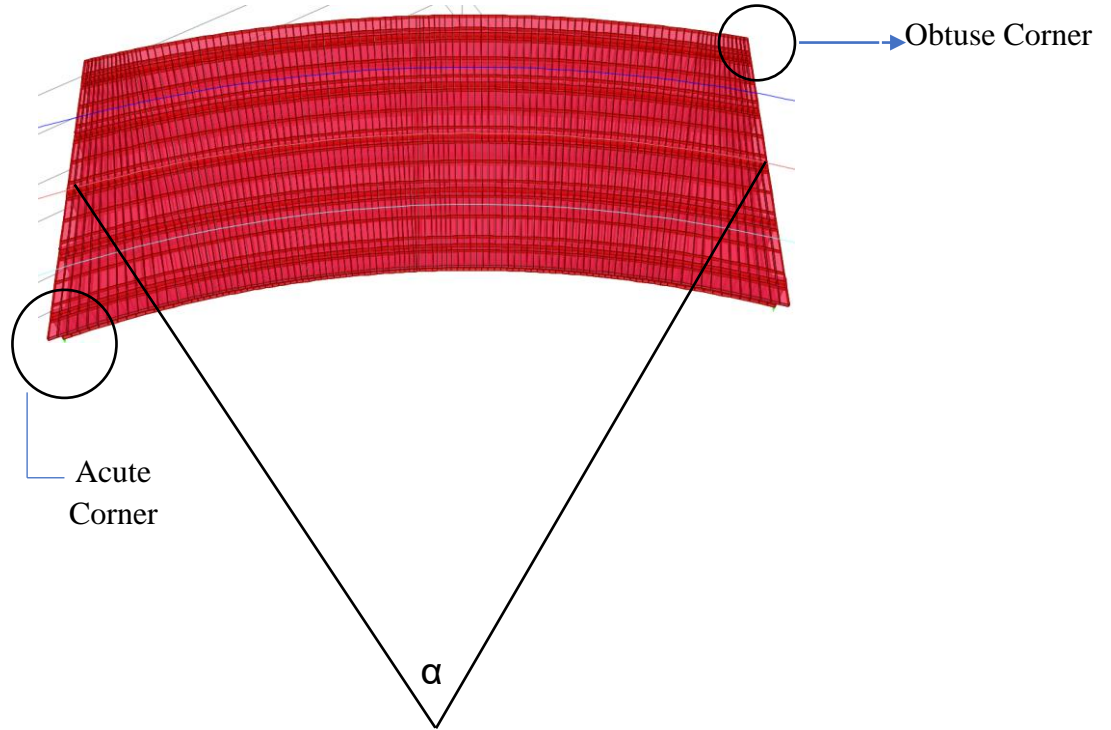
General Plan Layout for model Skewed-Curved Bridge
